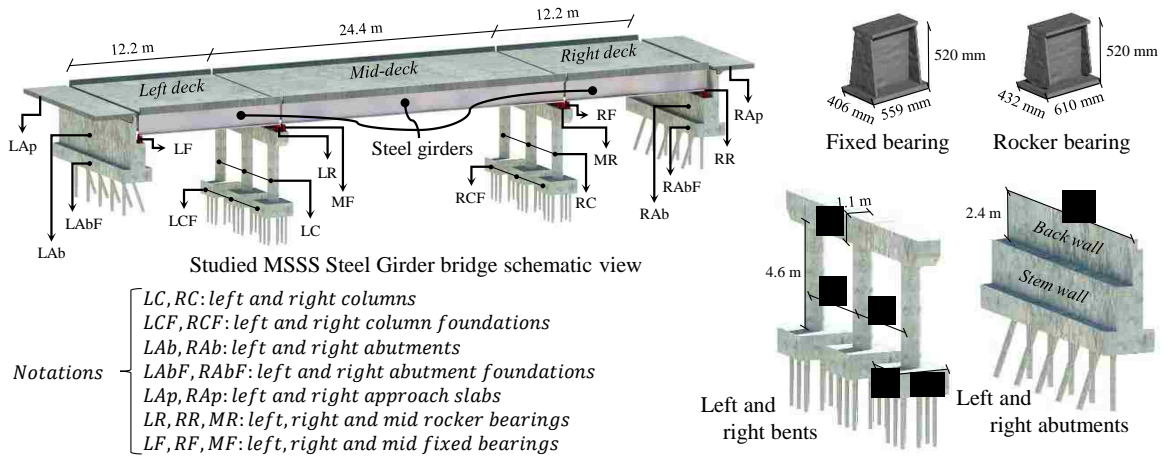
Schematic view of the example 3D MSSS Steel Girder bridge.
